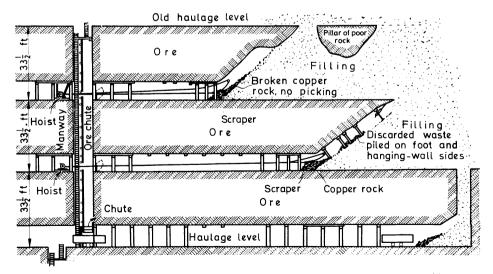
Sublevel, inclined cut-and-fill system, Champion Mine, Michigan.⁽⁸⁾
